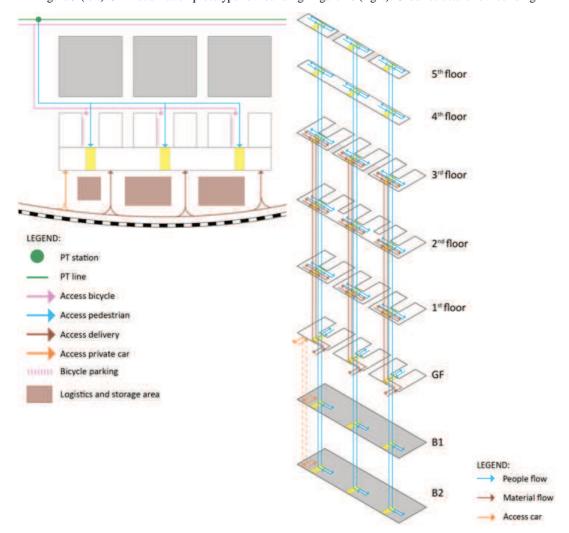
(left): Transportation concept row building. Figure 12 (right): People and material flow row building. GF...Ground floor, B...Basement
